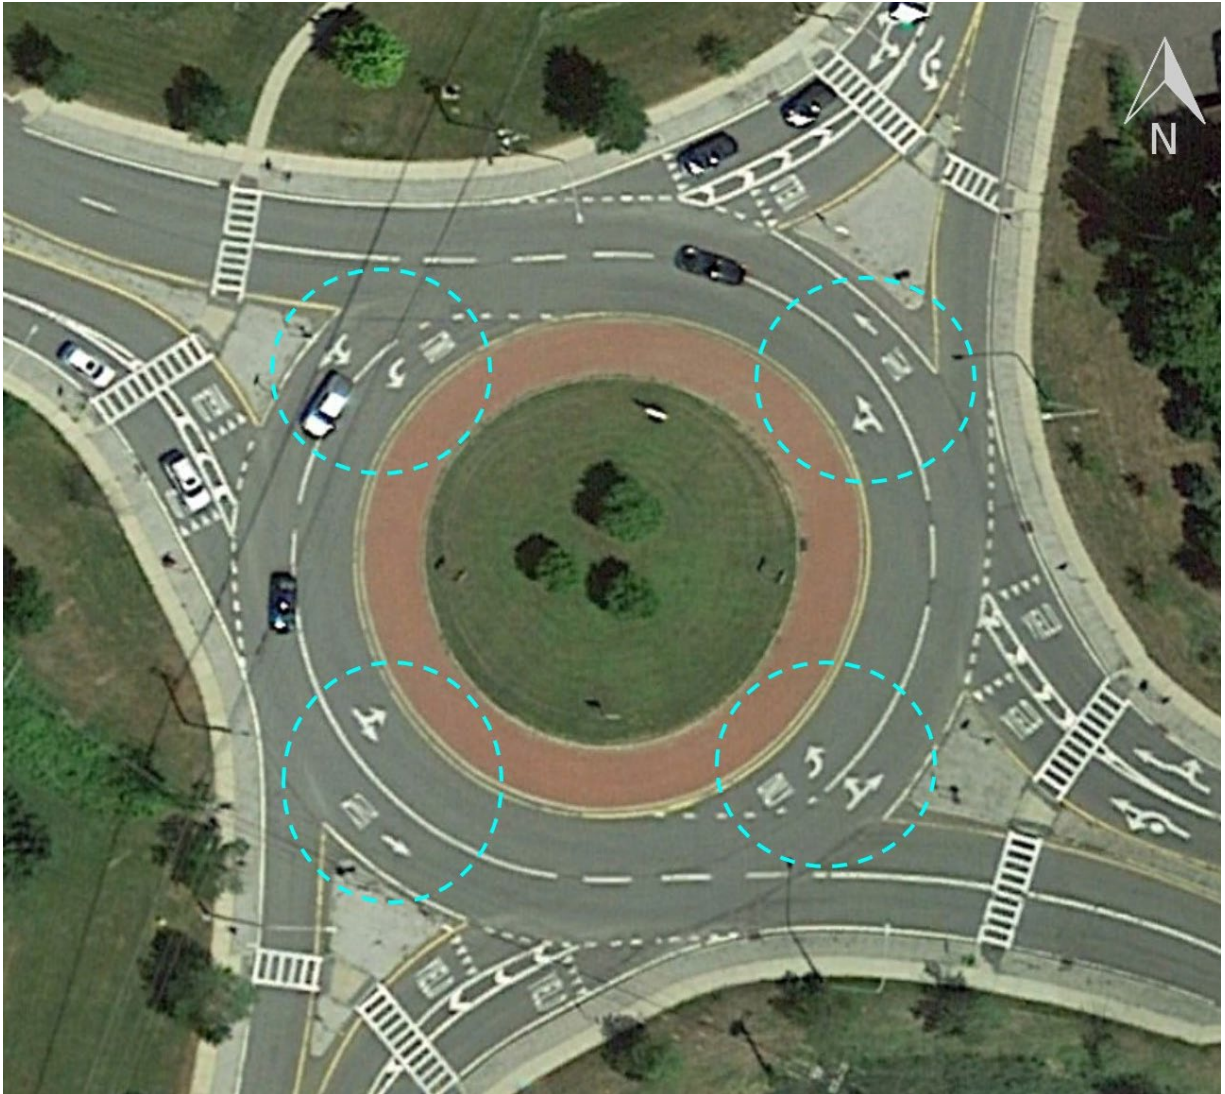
Photo. Wales—Circulatory lane-use pavement arrows.
